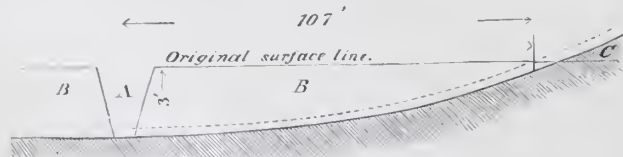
SECTIONAL VIEW OF LATERAL TRENCHES.
